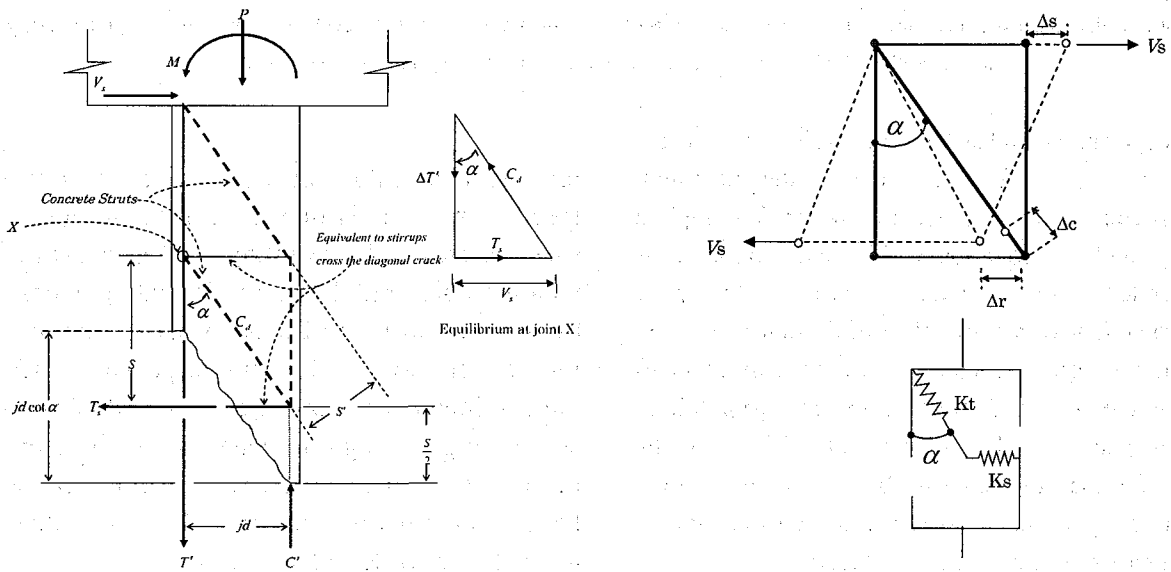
Shear distortions in the web of a reinforced concrete column, and the analogous truss.
